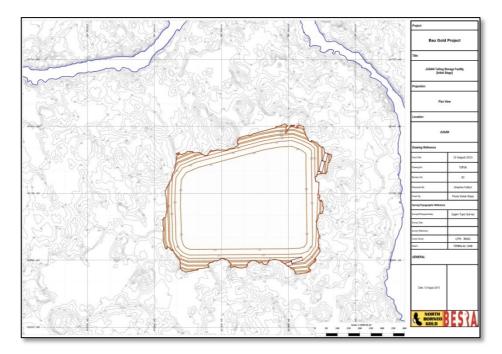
Plan View of Stage 1 of TSF at Jugan
